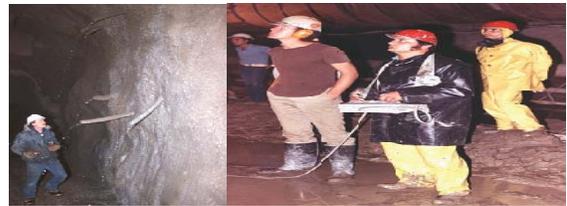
Shotcrete operated using a remotely controlled unit to apply shotcrete to rock face and Plastic pipes used to provide drainage for a shotcrete layer applied to rock mass with water-bearing joints.
